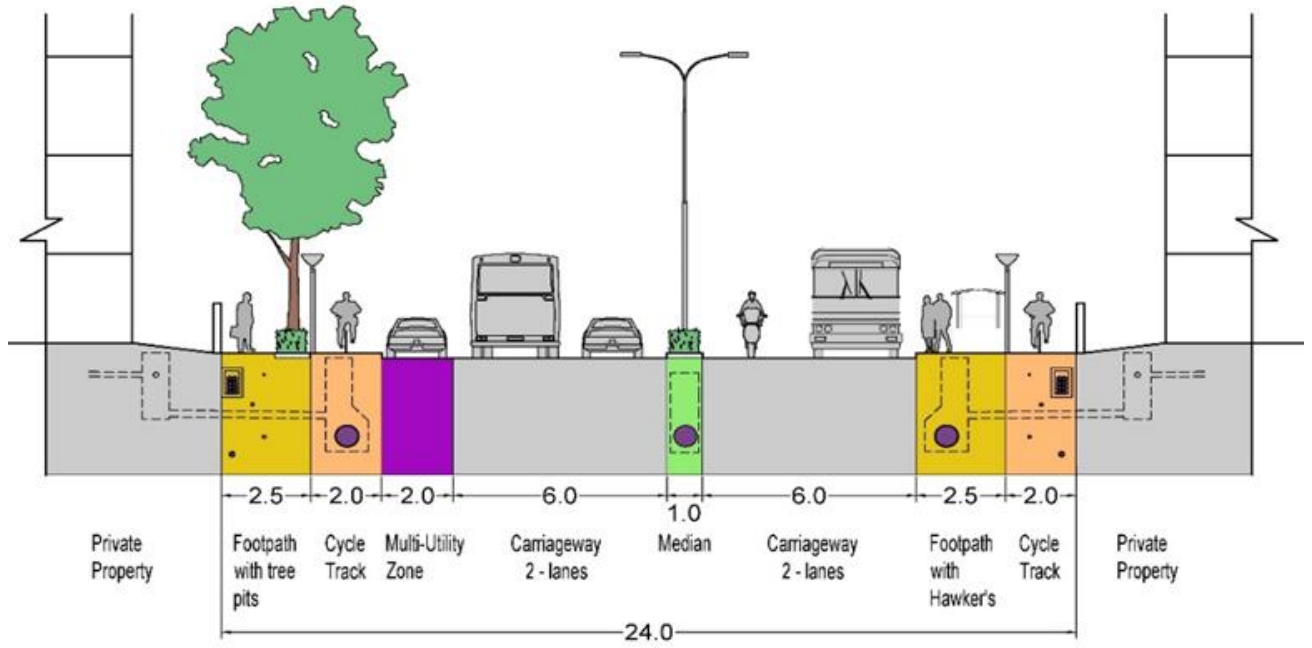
TYPICAL SECTION OF 24M WIDE ROAD
